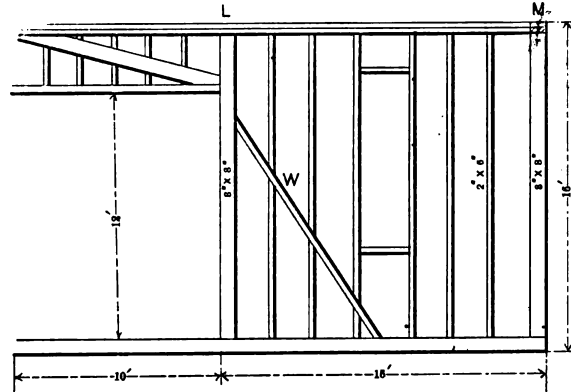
Partial Side Elevation of Frame of Barn, 48 x 52 feet.—Scale, 1/4 Inch to the Foot.
